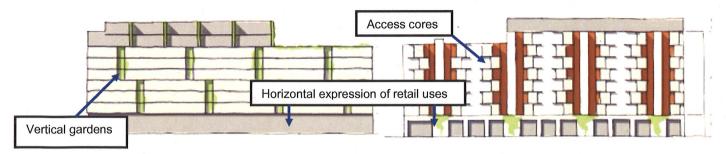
R9 Western Elevation (left) and R8 Eastern Elevation (right) depicting Building Legibility
